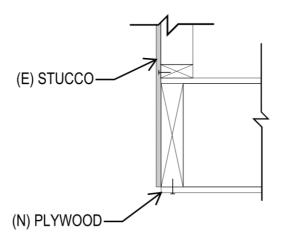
An alternative detail to stucco demolition that uses new plywood.
